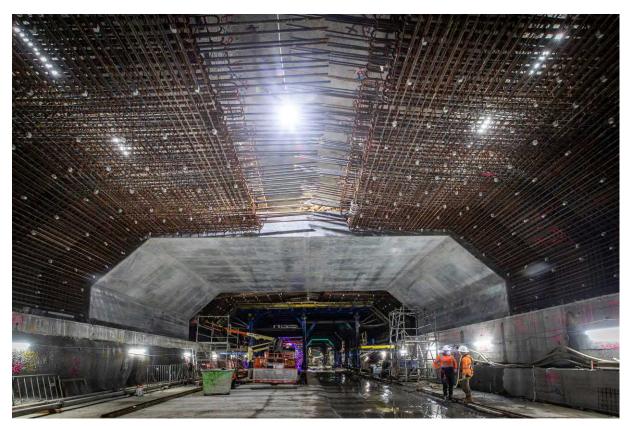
Bridging Slab formwork and partially poured sections, Pyrmont Bridge Road, Sept 2021.
